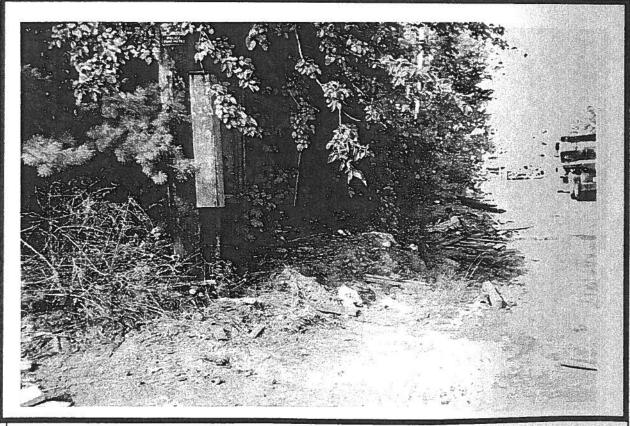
Soil Strip Parallel to Feaged Hedgerow and Concrete Apron
